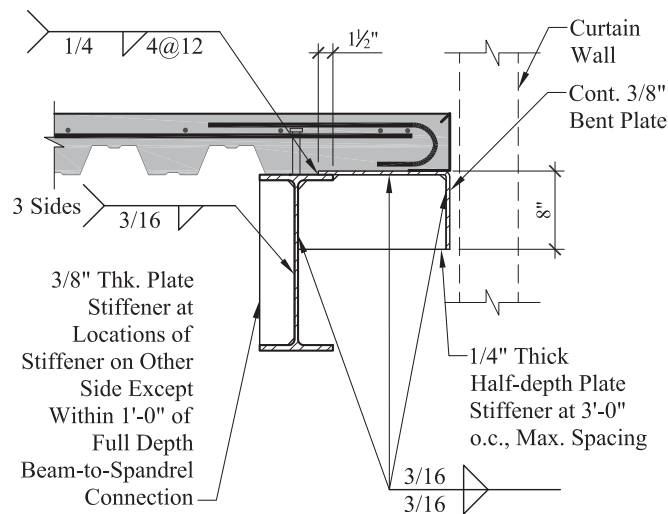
Sample structural steel detail at curtain wall attachment.
